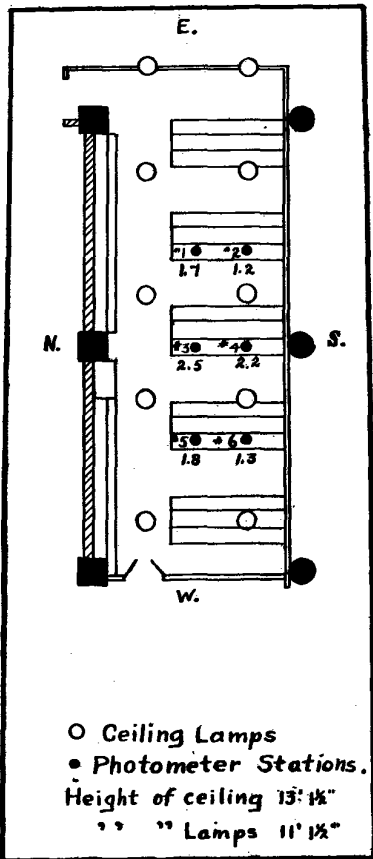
Section plan of fourth floor, (packing department), showing location of furniture, pillars, lighting units, test stations and illumination data.
